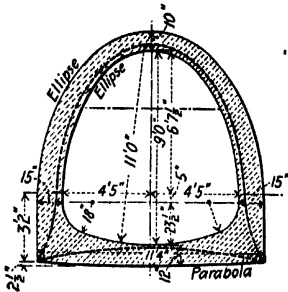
Louisville, Ky., Northwestern sewer, Section B1, Contract No. 53, 1910, J. B. F. Breed, Chief Eng. Horse-shoe shape, 13 ft. 6 in.  $\times$  9 ft., equivalent to 11-ft. 3-in. circular sewer. All transverse bars 3/4 in. square 9 in. c. to c.; longitudinal bars 3/4 in. spaced as shown. Excavation mainly in sand and gravel with some yellow clay.
